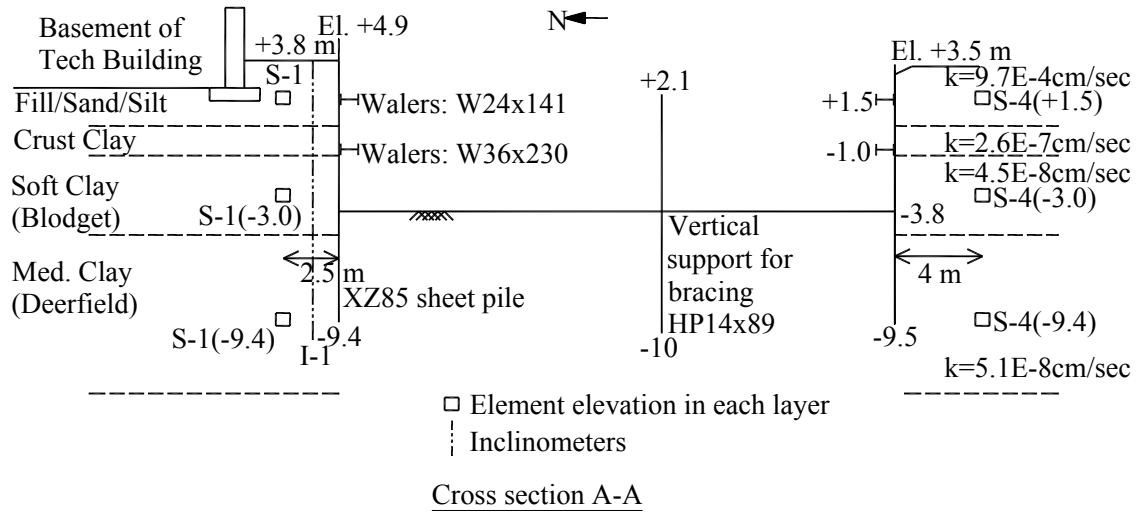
Eastward facing section, Ford Center excavation, modified after Blackburn (2005)
